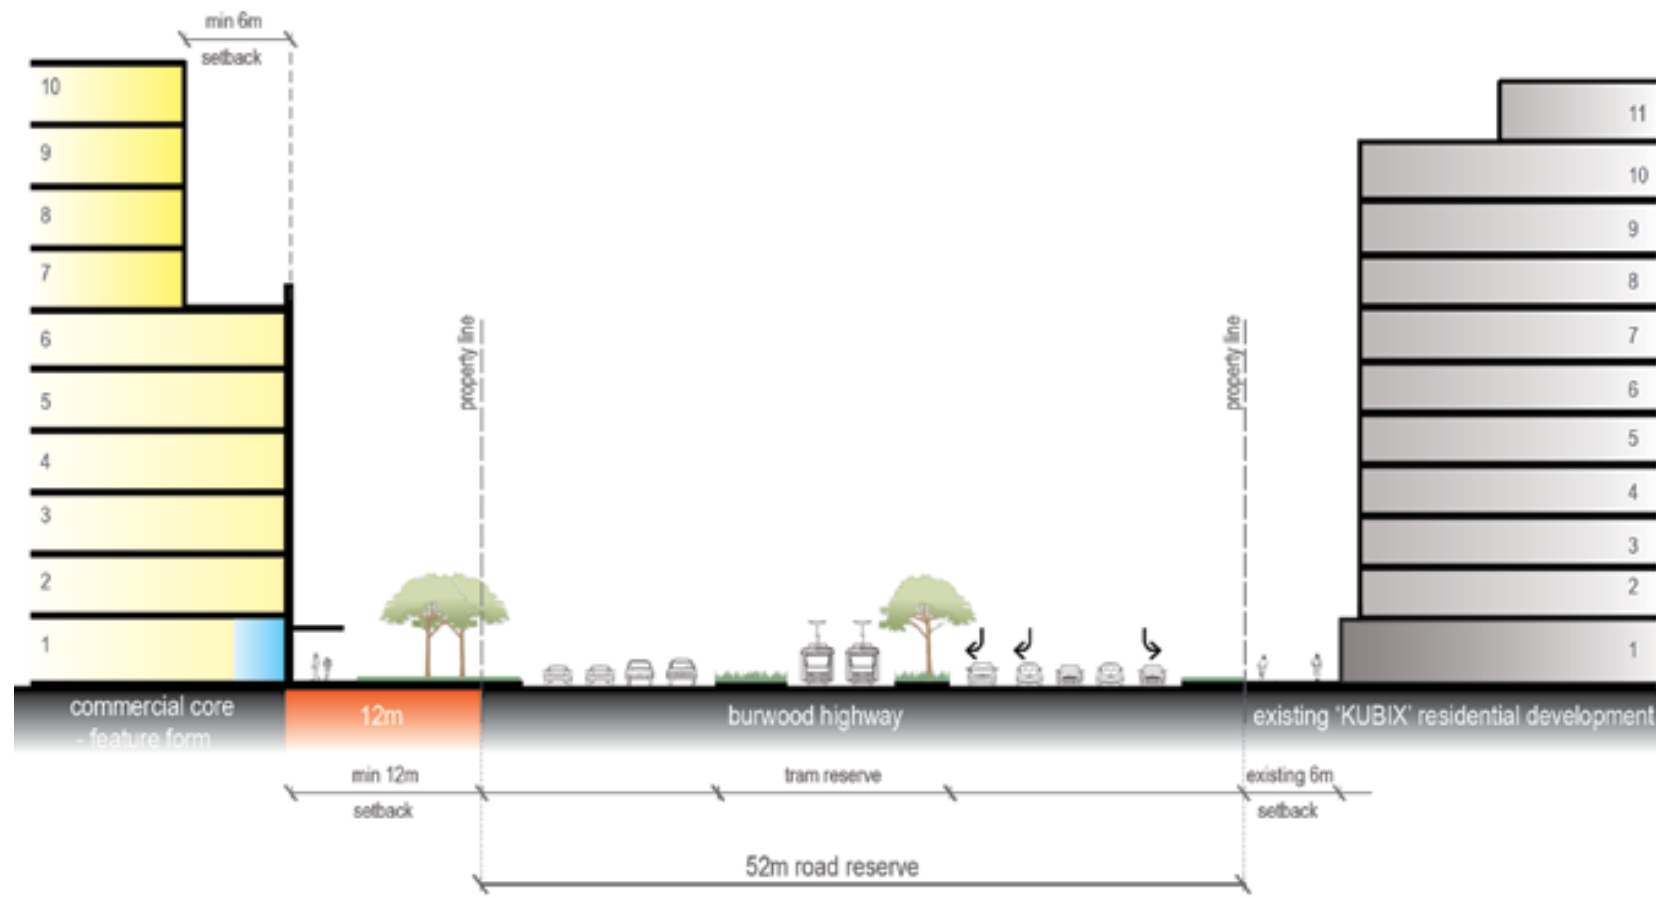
Section Diagram Commercial Core 'feature form' and Burwood Highway South Interface (existing Kubix building) (Section a)
